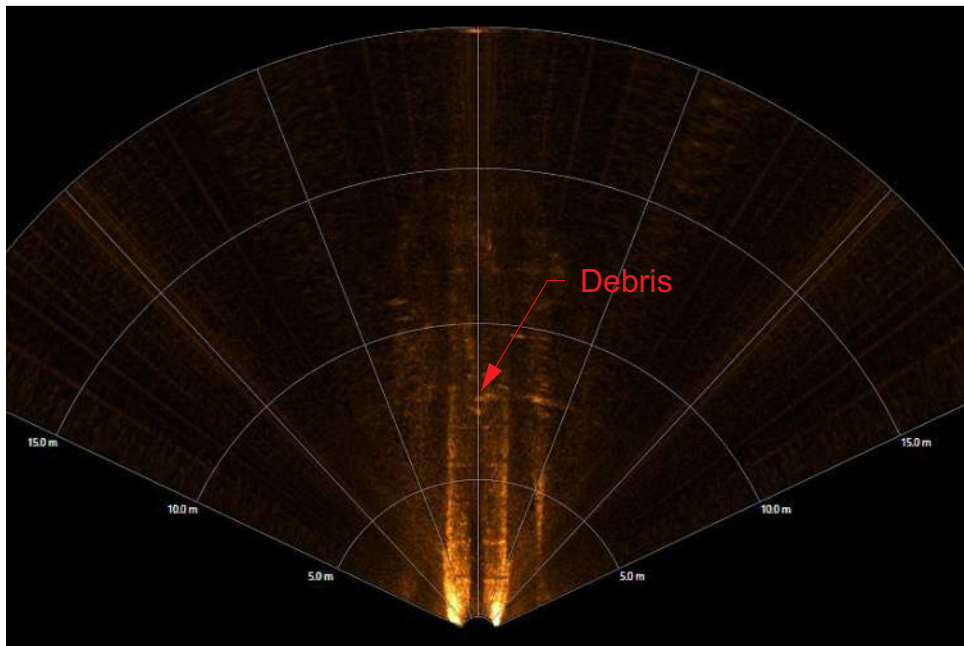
Sonar image at 84 feet downstream of Access Point 1. Debris on invert 26 feet ahead.
